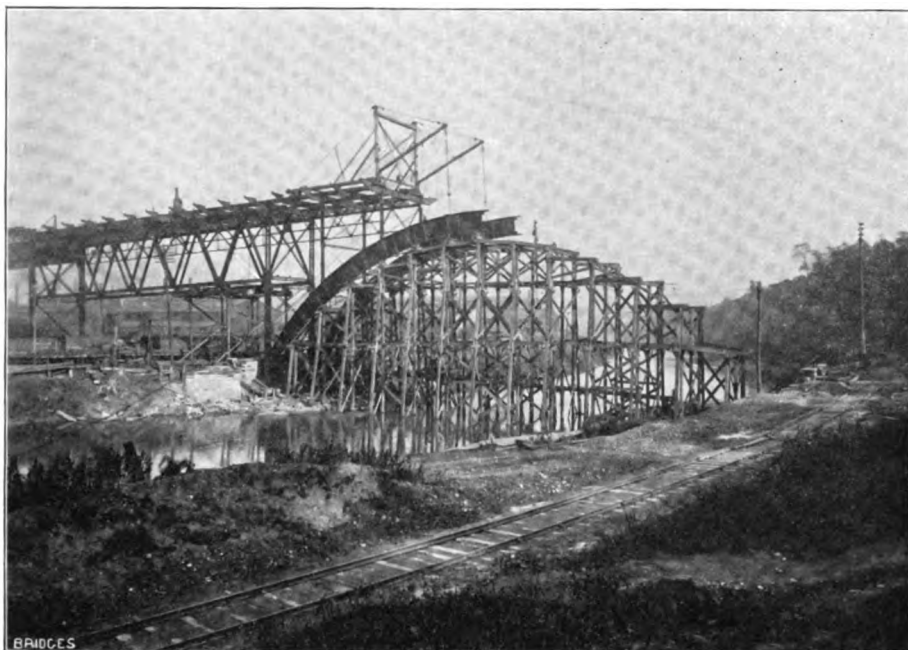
MARKET STREET PLATE GIRDER ARCH.
